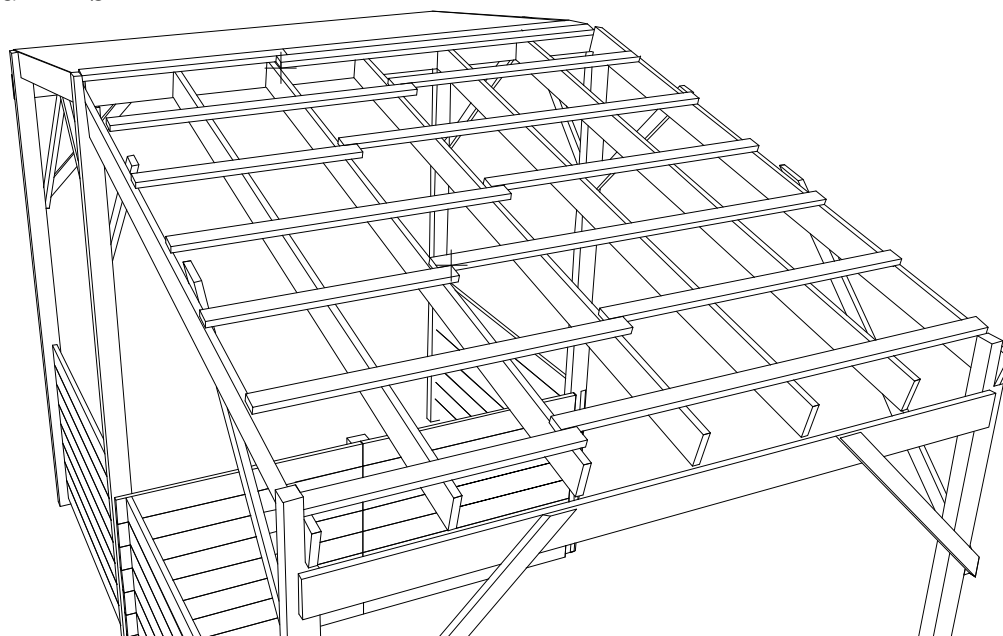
If nailing roof purlins flat, rafters may not be spaced more than two feet. Lapping the purlins, as shown above, allows the best connection and is the preferred method if flat purlins are used. Use two 10d ring shank nails in the purlin-rafter connection.
